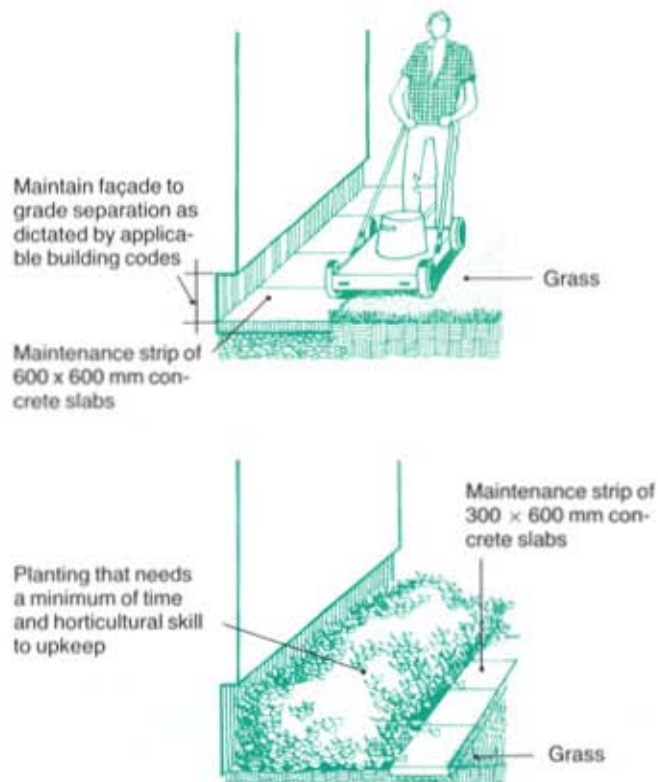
Maintenance strips are normally 300 to 600 mm wide; they should be placed to minimize hand-trimming and to protect plants and building edges from damage by lawn mowers and other maintenance equipment.
